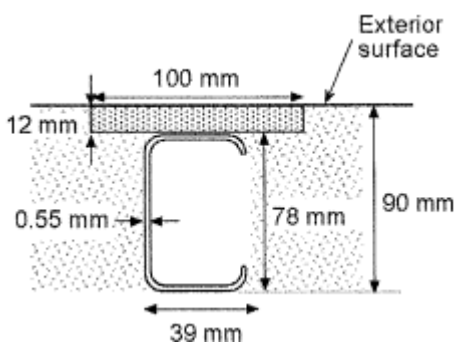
Example of thermal break provided between framing and cladding within metal stud wall – Source: NZS 4214:2006
